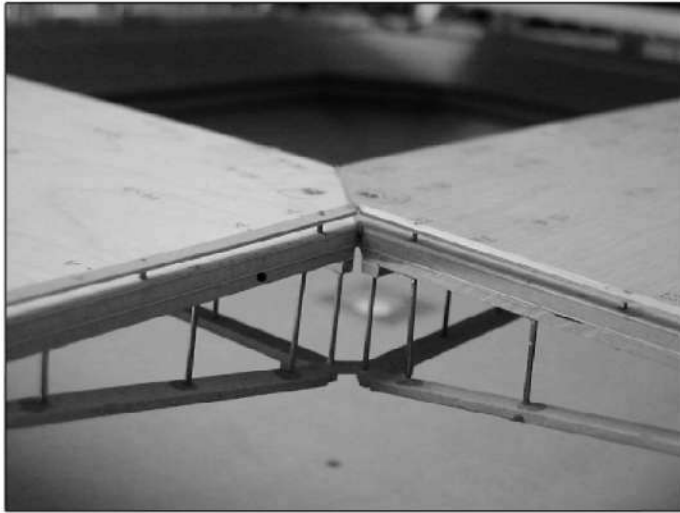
Cantilever parapet set on the eaves of the model's grandstands' roofs.
